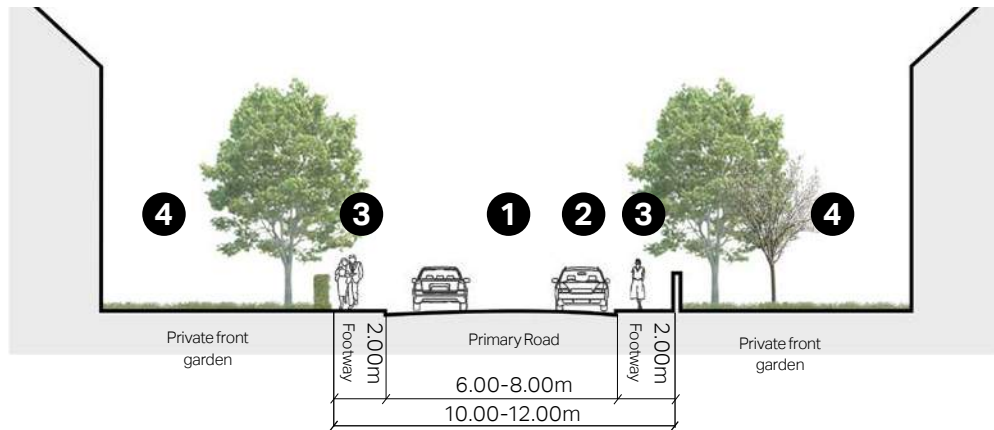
Section showing indicative dimensions for primary routes (road width may vary to provide space for parking)
